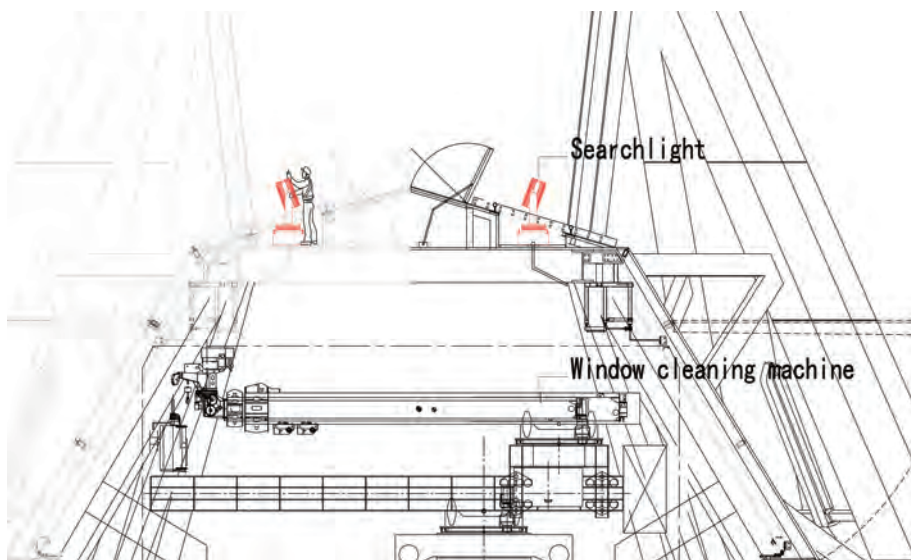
Sectional drawing of the layout of the searchlight fixture (Source: Beijing Fortune Lighting System Engineering Co., Ltd.)
